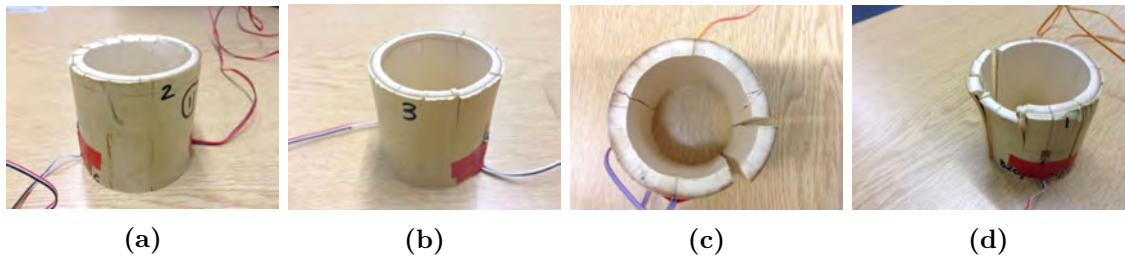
Failure of the full culm specimens under compression. (a) Penetration of the steel wedges in the culm wall thickness. (b) Densification of the inner side of the culm wall thickness. (c) Longitudinal splitting. (d) Combination of failure mechanisms, including bending and barrel shape, delamination, densification and local buckling.
